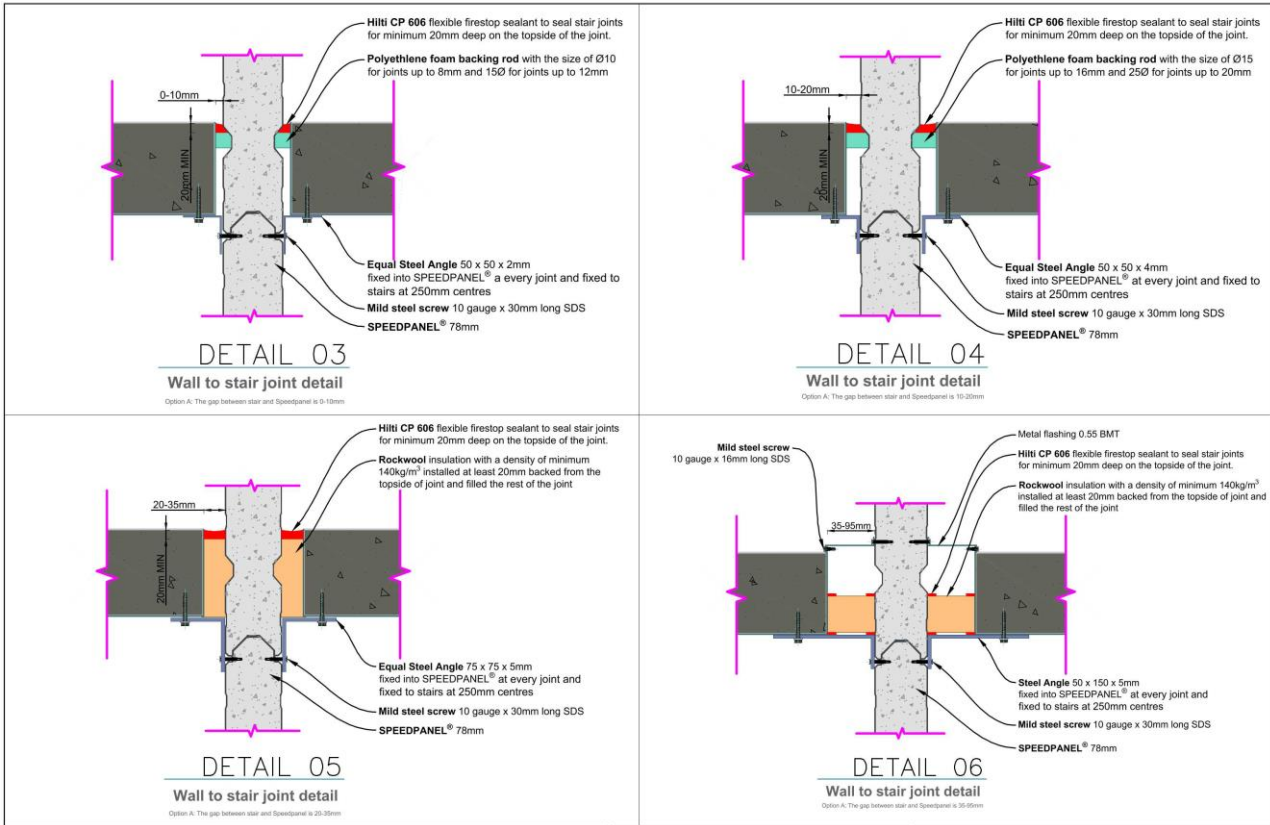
A- Wall to Stair joint detail variants (as referenced in Figure 27A without panel cladding)
